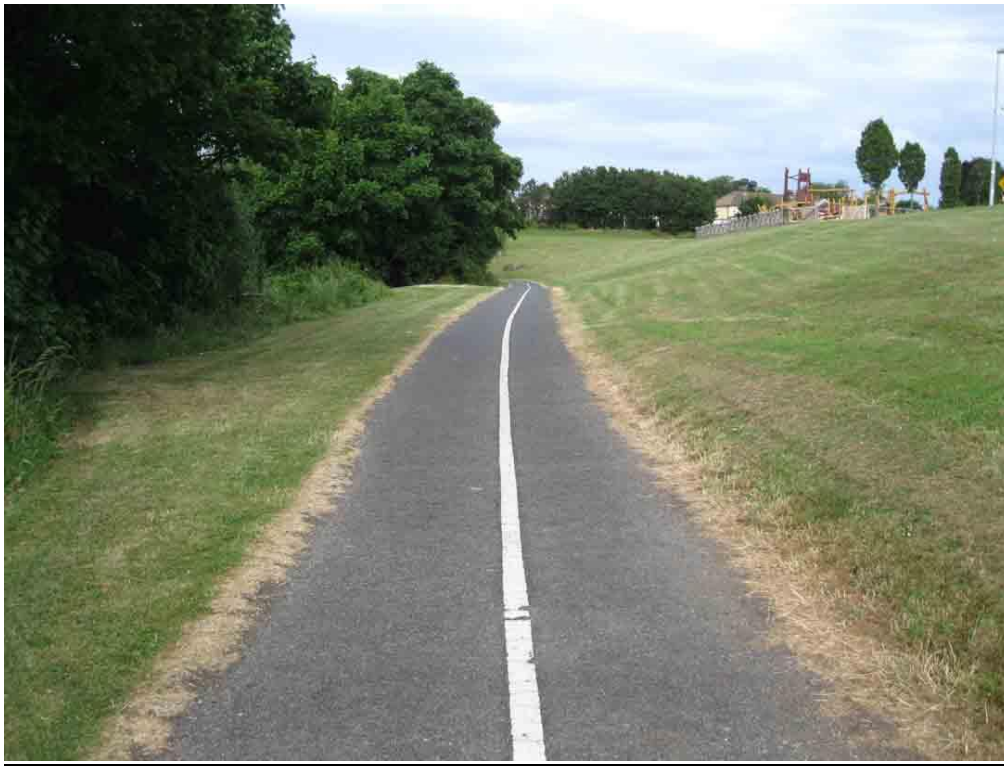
DLR: River walk from Classon's Bridge to Packhorse Bridge
